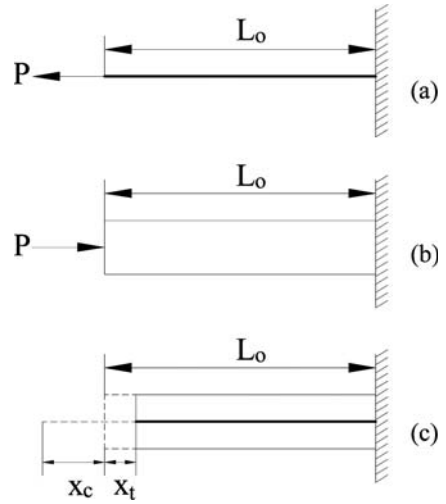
Post-tensioned cable (b) Compressed tube. (c) Dimensions of tube and cable after post-tensioning.
